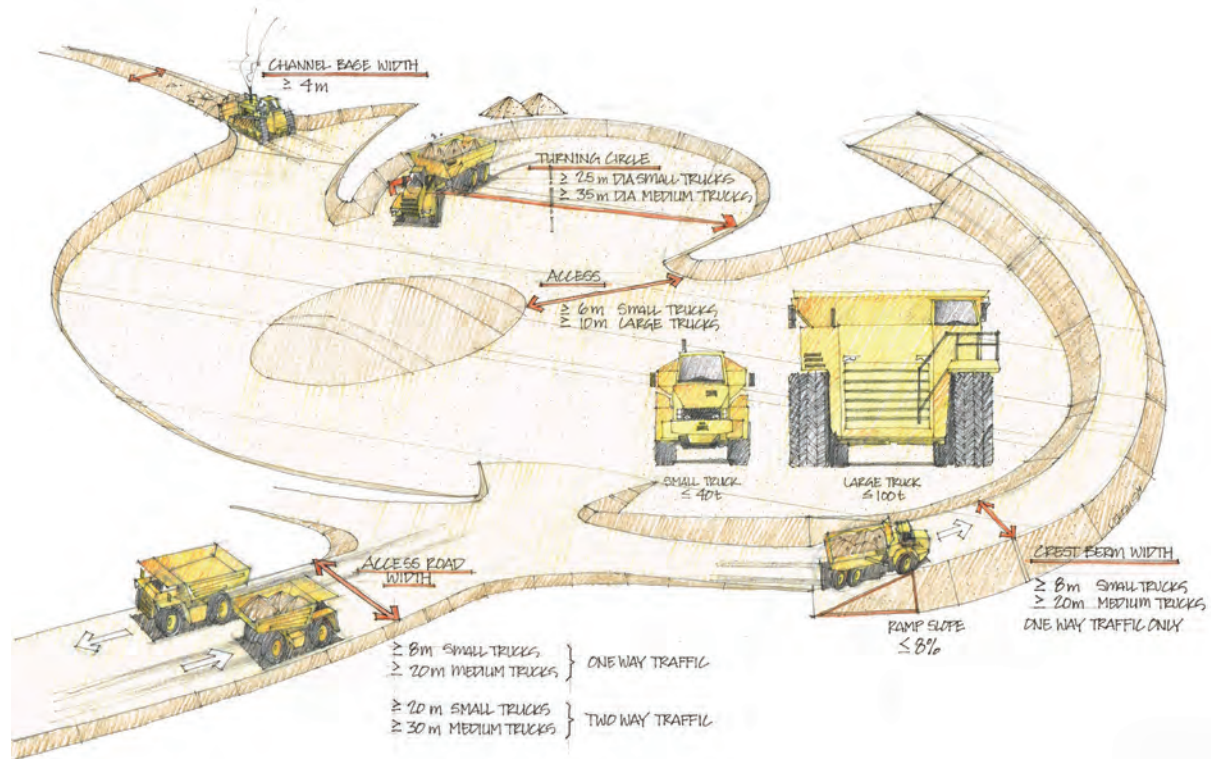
Typical design dimensions to allow construction access by mining equipment. (Dimensions based on Caterpillar Handbook, 2013).
